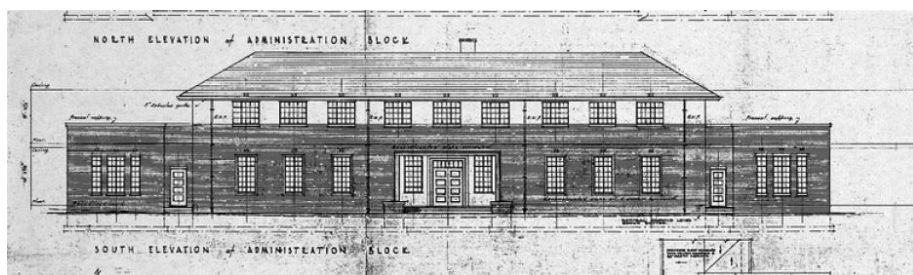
The original building plan (south elevation for the administration building on Stikland North (Louw 2019)
